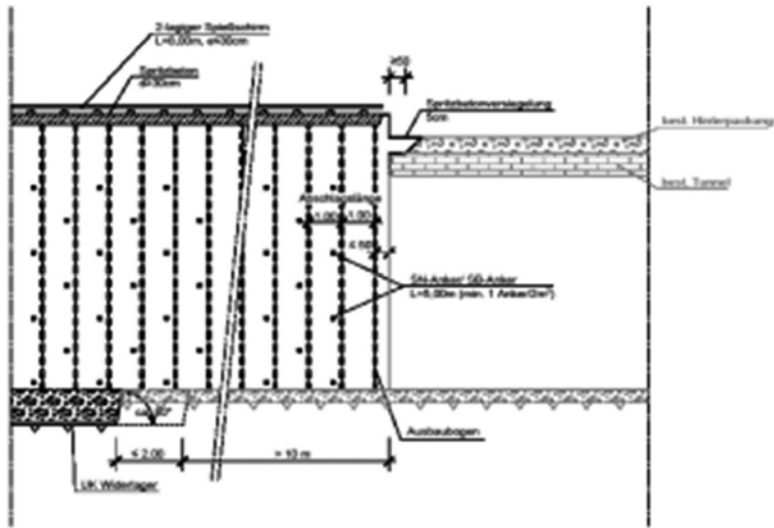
Excavation class 6A4 (staggered excavation of vault and abutment).
